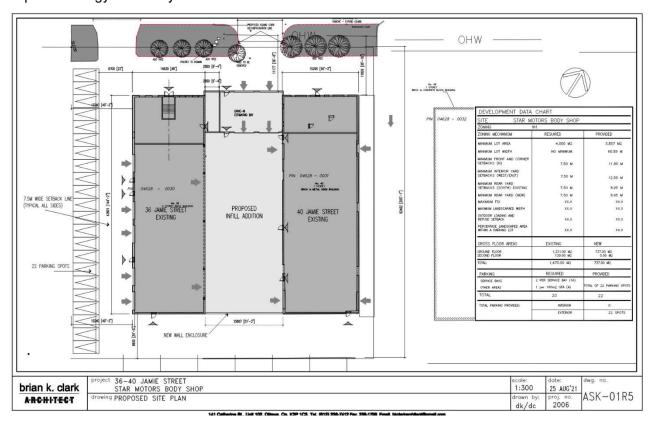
Site Plan showing the proposed addition (light grey) connecting the existing buildings (dark grey).
